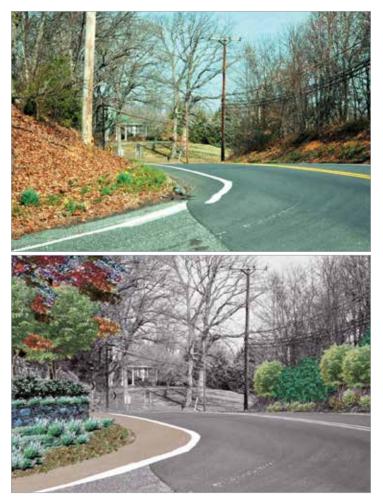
Existing conditions at Duley Station Road and Croom Road intersection; looking north
